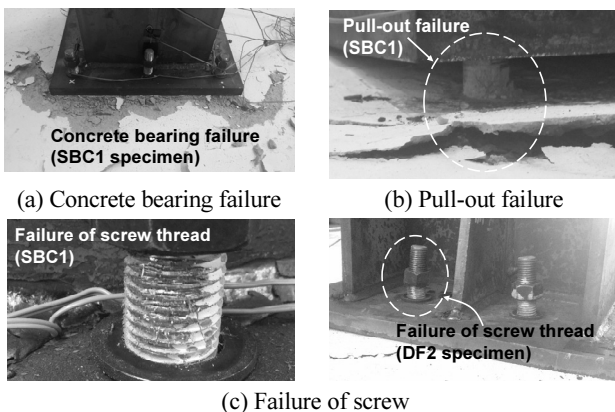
Typical damage and failure mode of exposed steel base plate connections
